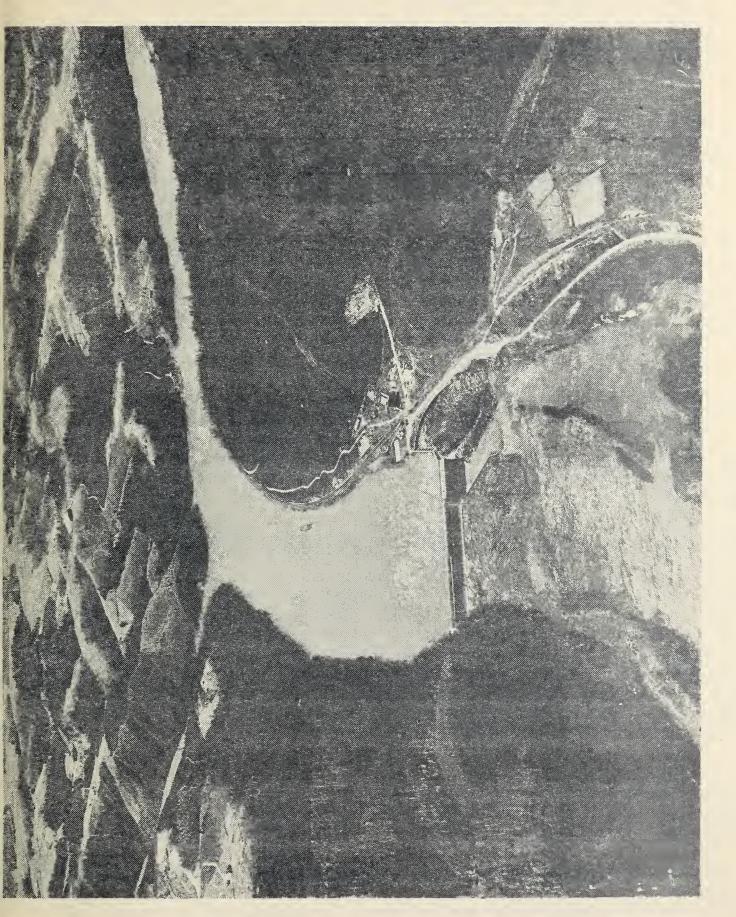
Aerial view of Byllesby plant and reservoir. Crooked Creek enters from the left. (Courtesy of Aerial Surveys of Pittsburgh, Inc.)
